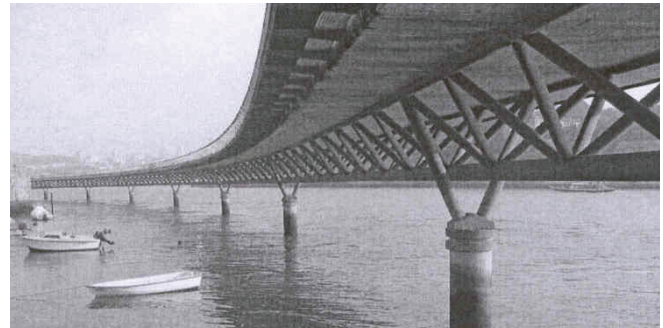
The Cas das Piedras Bridge in Portugal (photograph courtesy of Alain Nussbaumer).
